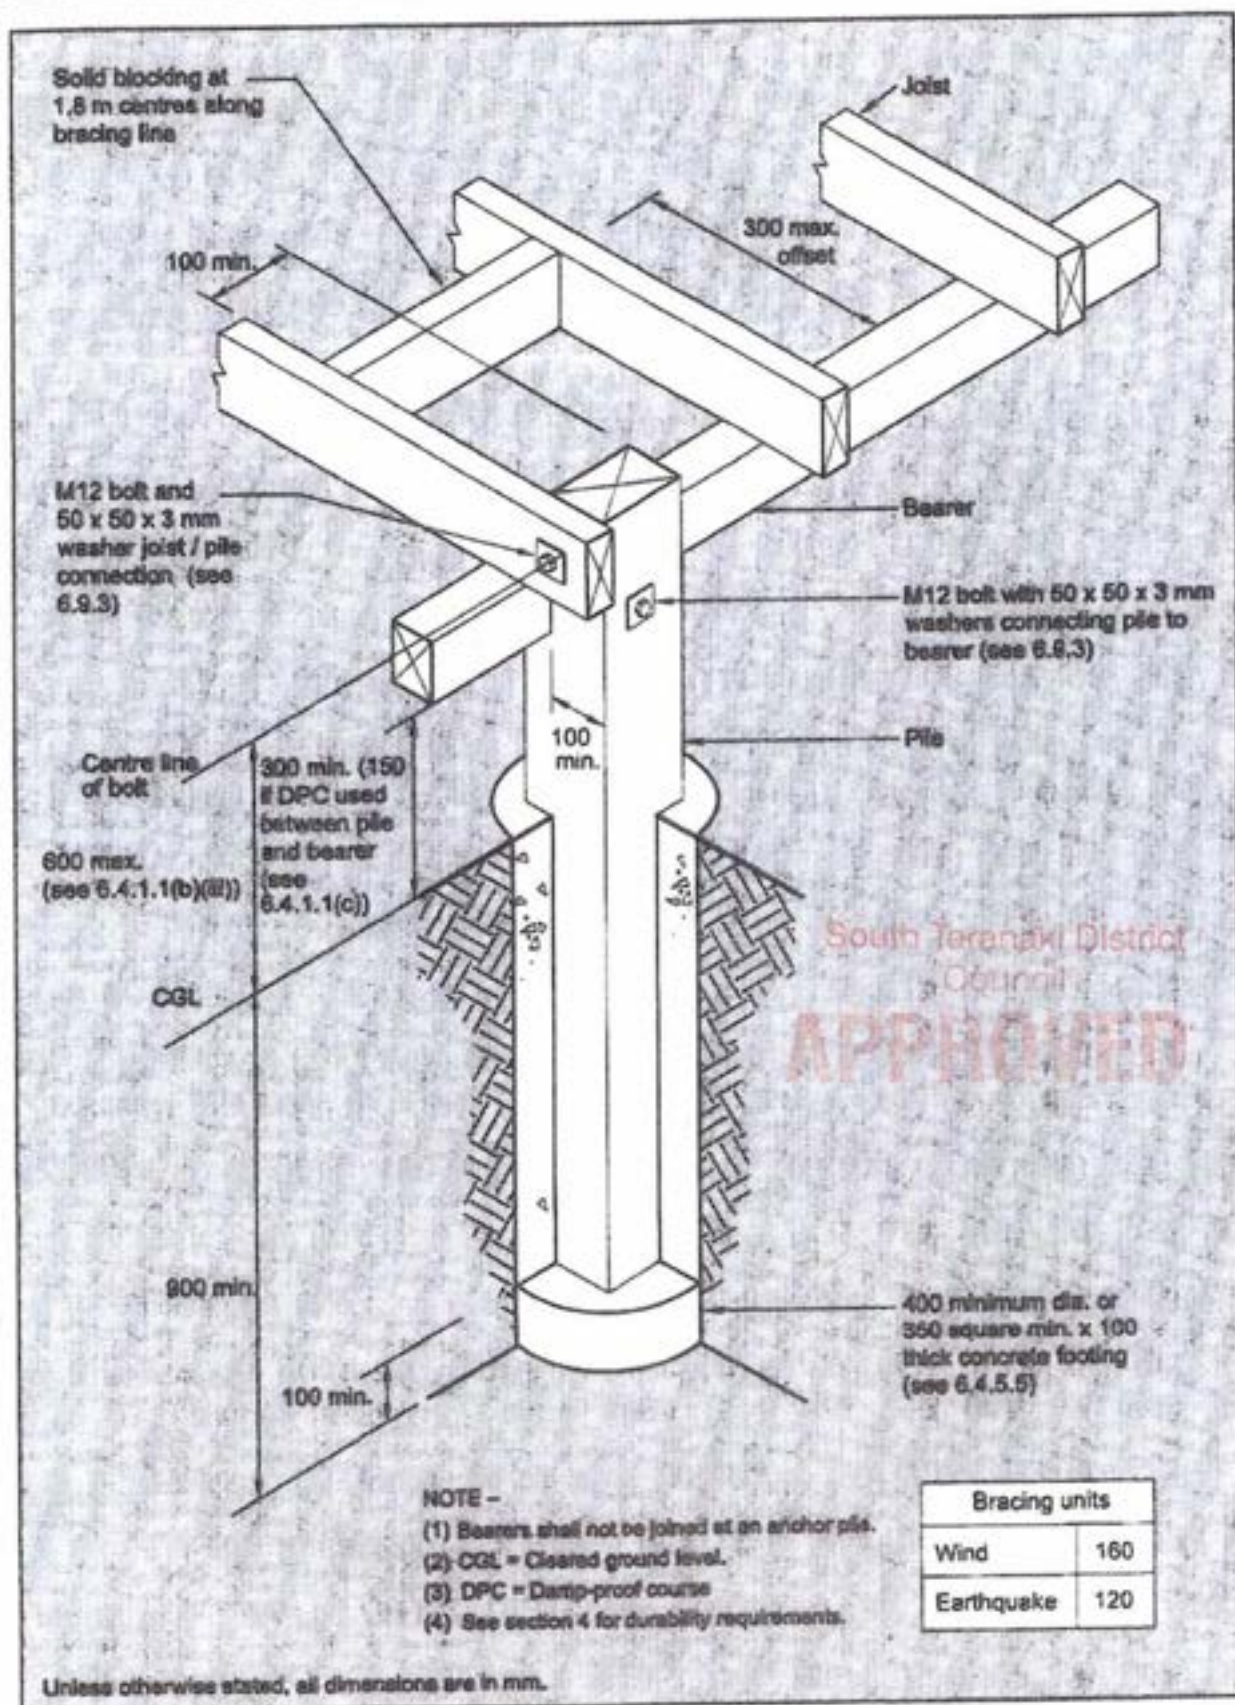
Anchor pile directly connected to joist and bearer (see 6.9)
